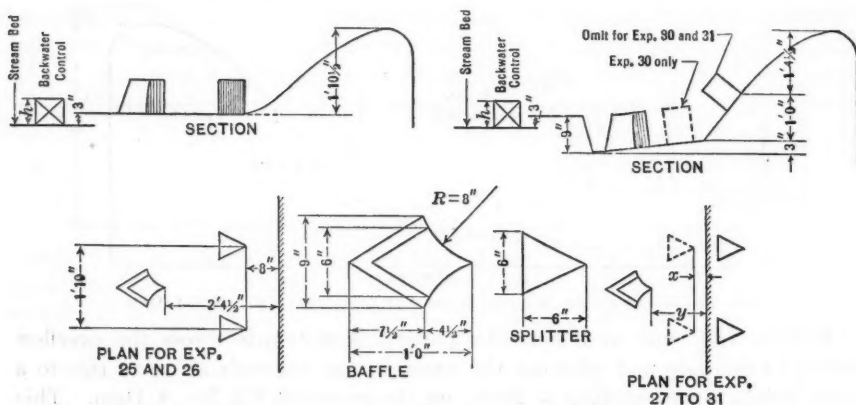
DETAILS OF MODELS WITH BAFFLE-PIERS, PIT NO. 4 DAM.
